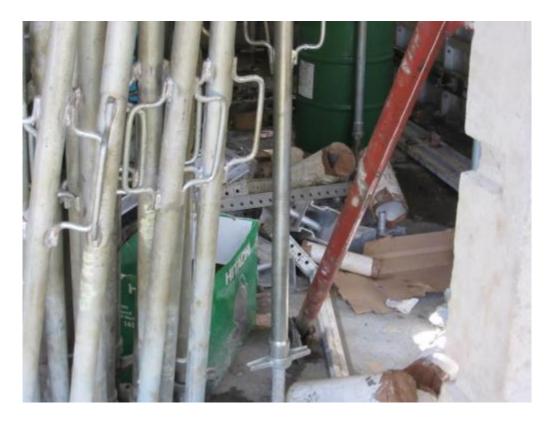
Construction Wastes Noted in the Working area of Aluminium System Formwork
